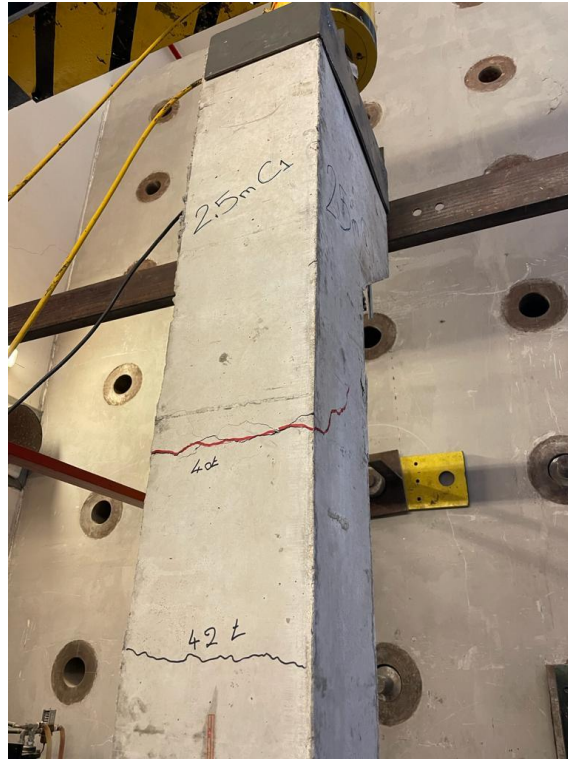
Cracks at the tension side of Column 2.5-C00-1
